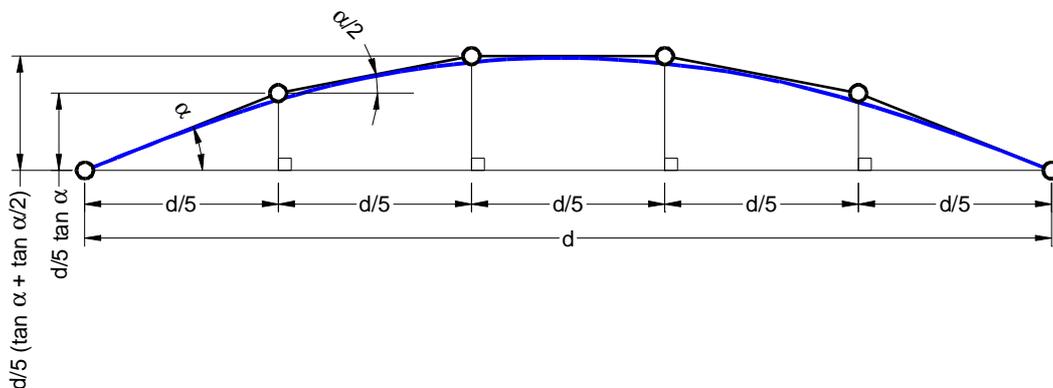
, the construction used to develop a shallow circular arc, resembling a bridge span.
